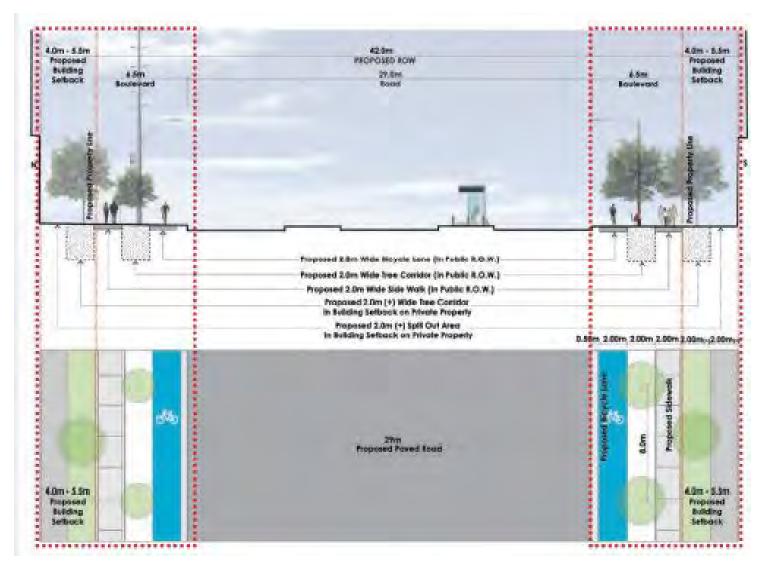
Dundas Connects Master Plan Figure 5-63 - Raised Cycle Track & Street Trees
